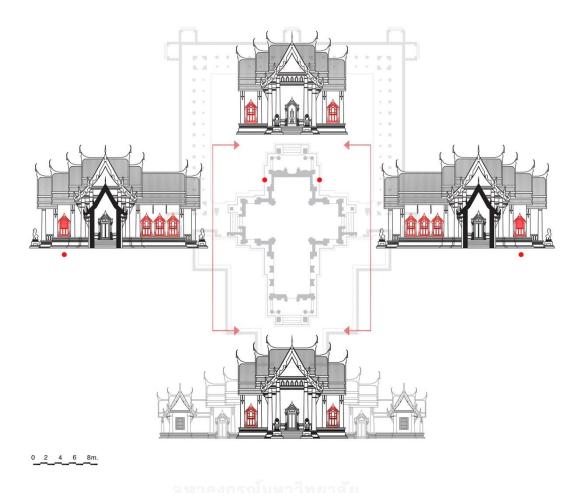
locations of the window replicas marked by red dots, the exterior of the ordination hall of Benjamabophit Temple. Plan, sections and elevations drawn by
